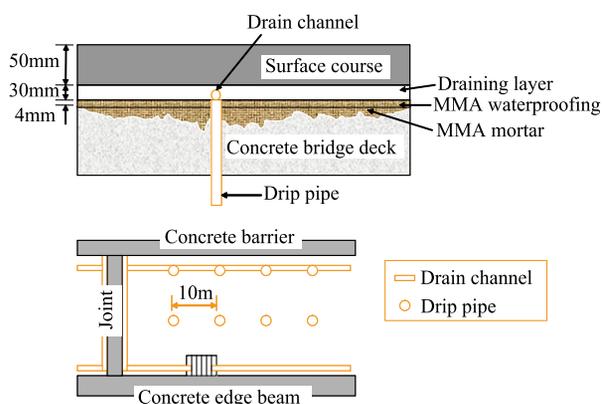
Section view and plan view of bridge deck pavements with the new drainage system installed
